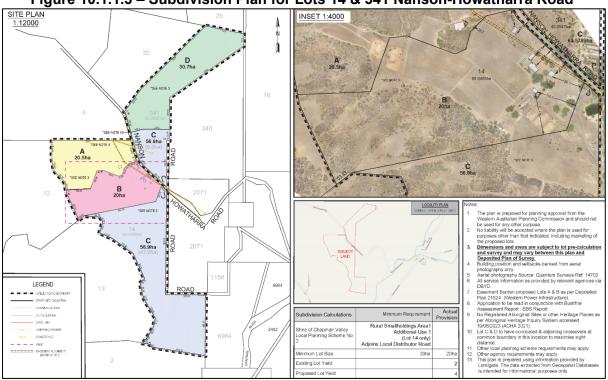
Subdivision Plan for Lots 14 & 341 Nanson-Howatharra Road
